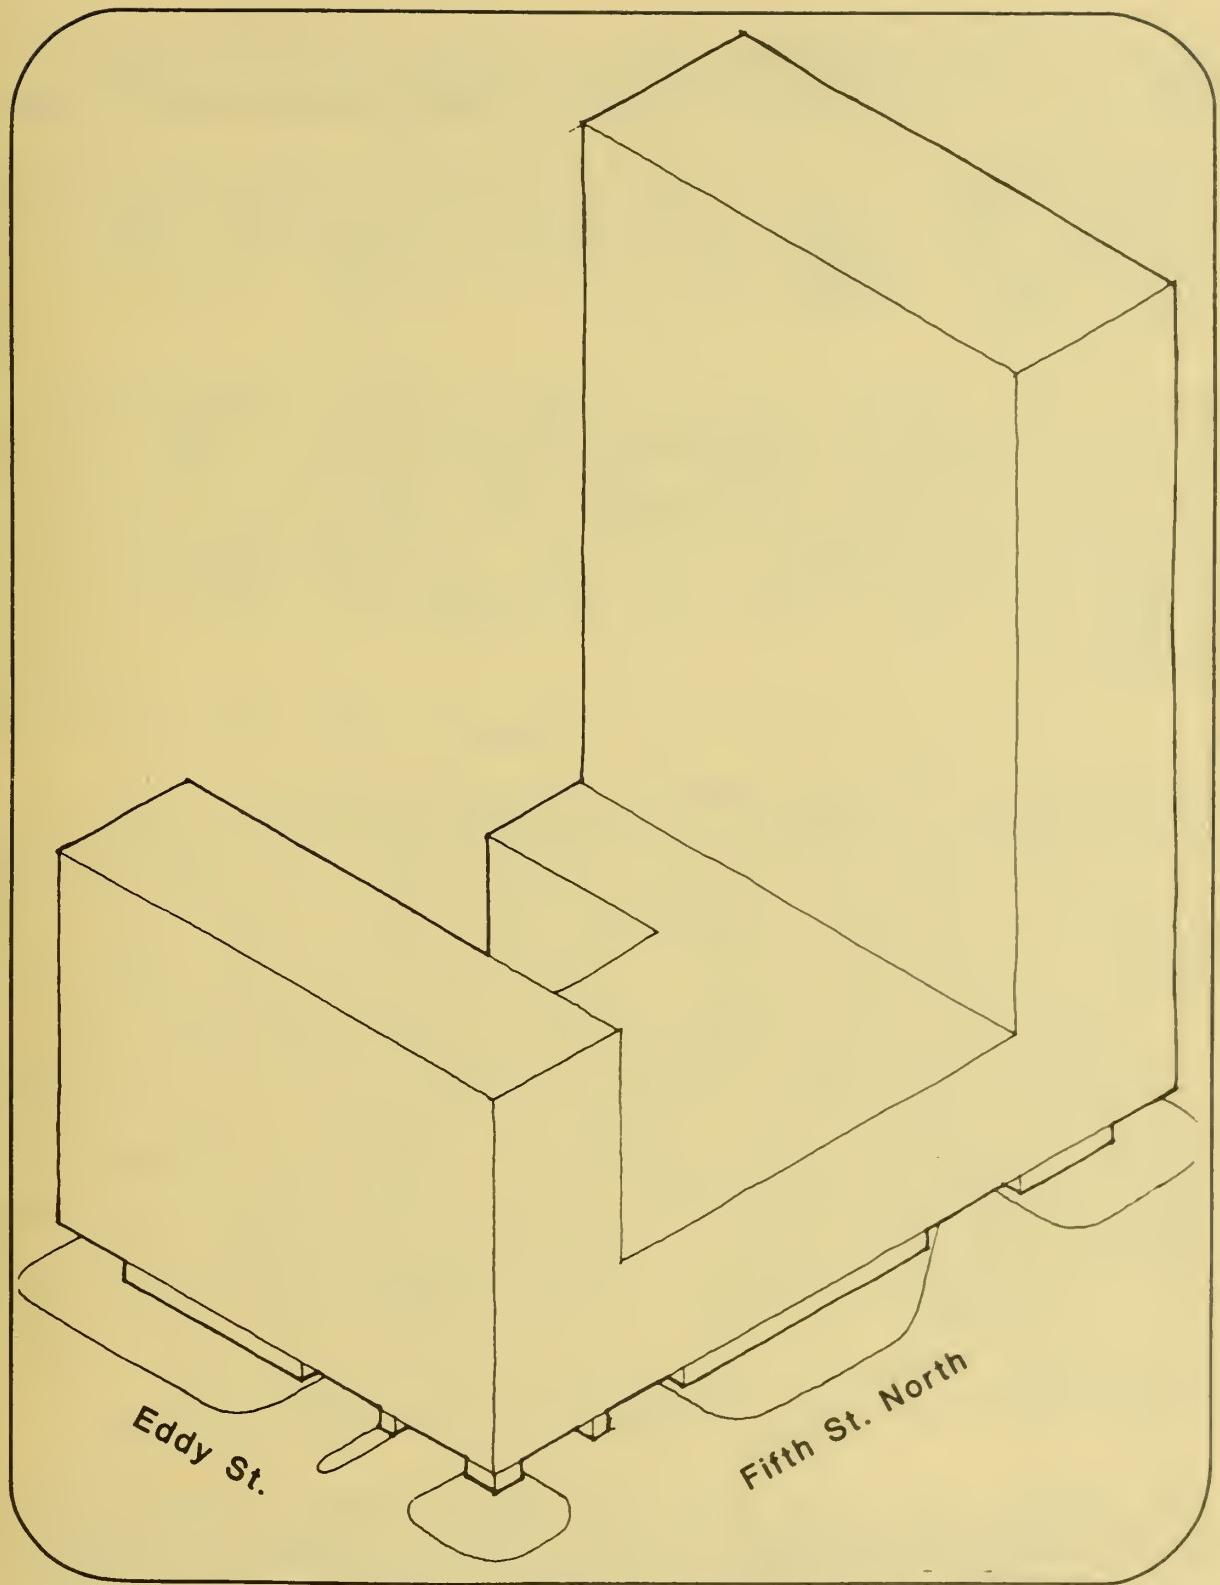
TWO-TOWER ALTERNATIVE -
